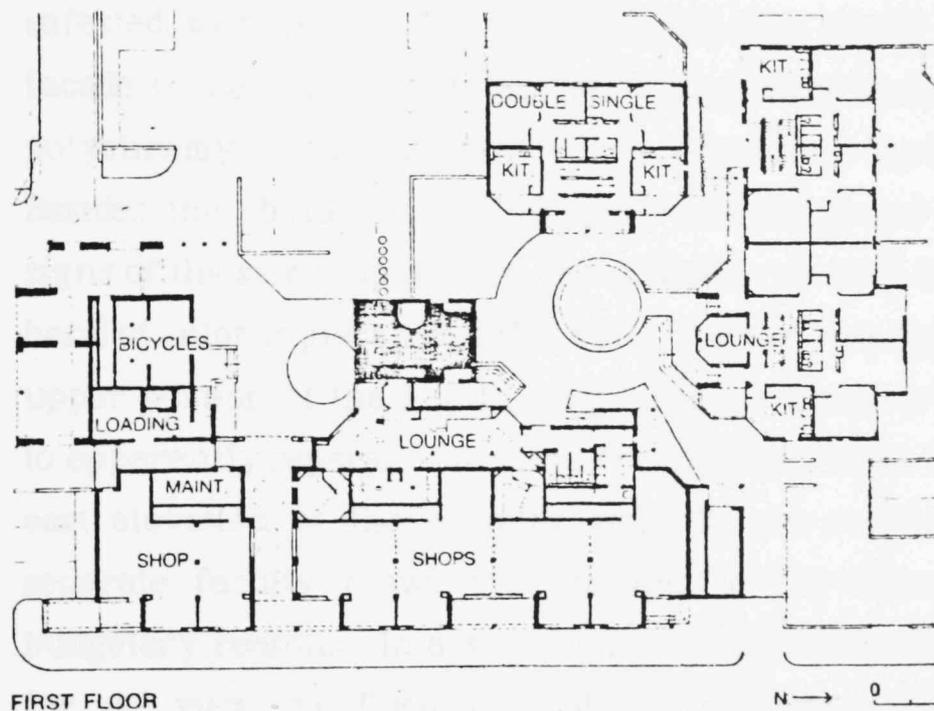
Pembroke Dormitory Site and First Floor Plan
